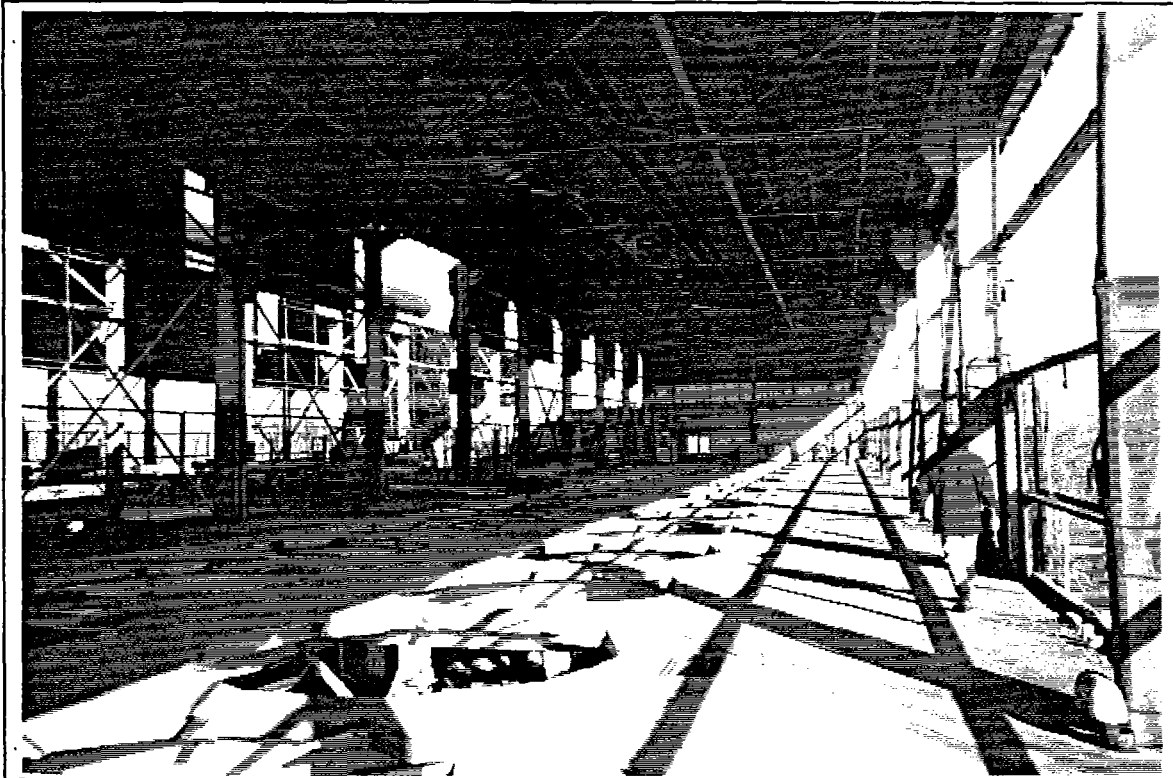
Building 6-01 - East wing, upper level. View of upper level of building looking north. Note open sides of building.
